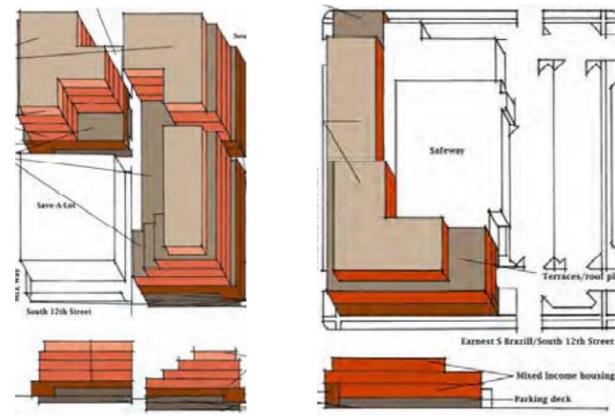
Left - Visioning study for the northwest corner of MLK Jr Way and South Earnest Brazill Street. Above - Envelope studies on potential development sites at the MLKHDA site at MLK Jr Way and South 11th Street, the Browne's Star Grill/Pochert Building site at MLK Jr Way and South 12th Street, the former Save-a-Lot surface parking lots, and the Safeway (see Appendix K of the Draft Hilltop Subarea Plan for details on the envelope studies).
